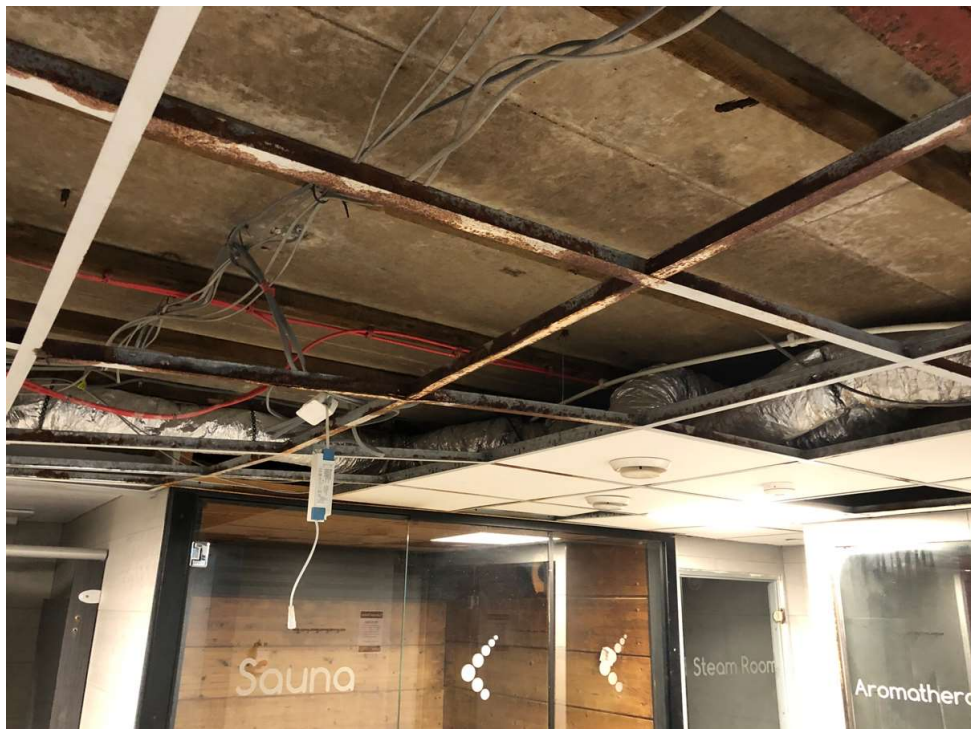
Assumed roof leak in the Spa has caused the suspended ceiling to fail. The roof to the Spa is a concrete flat slab with some supporting steel beams.
